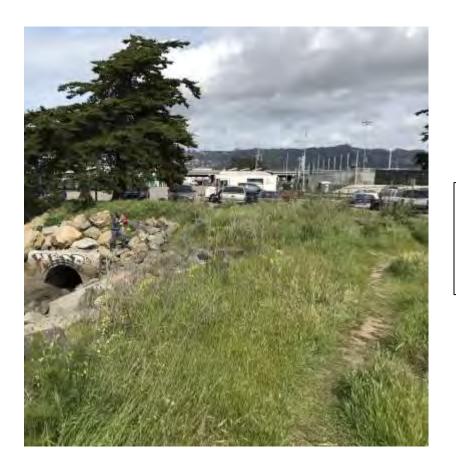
Photograph taken looking east toward outfall along Fleming Point (south of project boundary).
